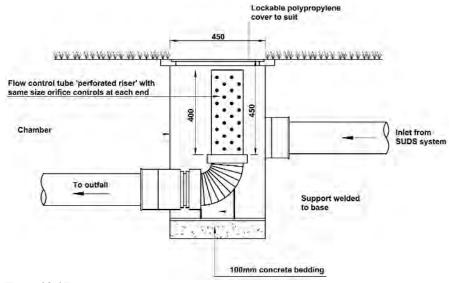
Conceptual layout of protected perforated riser outlet structure for small pond (courtesy Robert Bray Associates)
